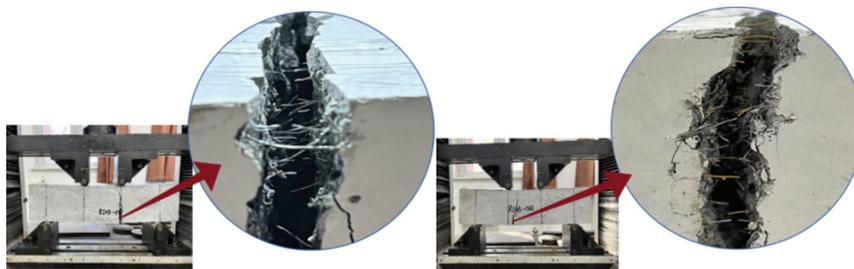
Damage pattern of fibre concrete beam specimens and fibre distribution at fracture
